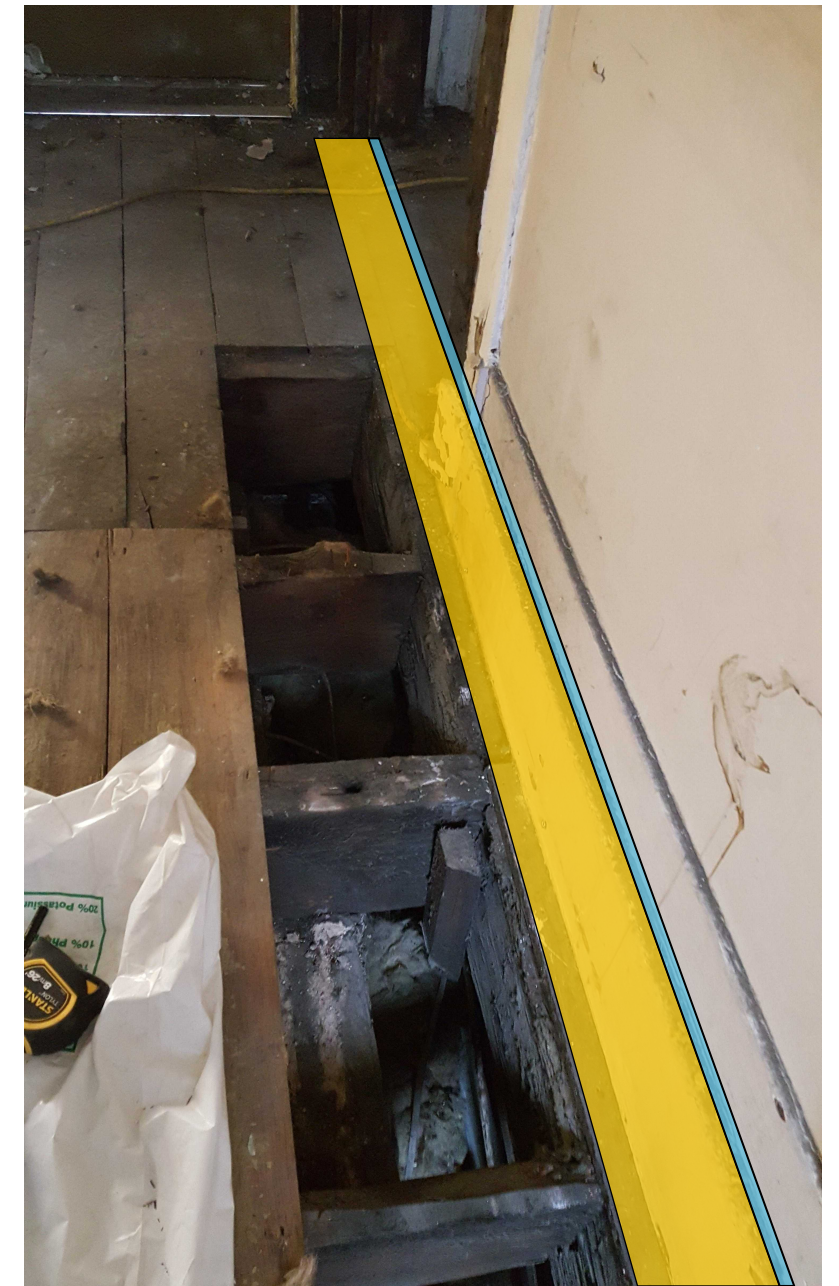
, Rear Floor Beam To Be Strengthened (Indicative)
